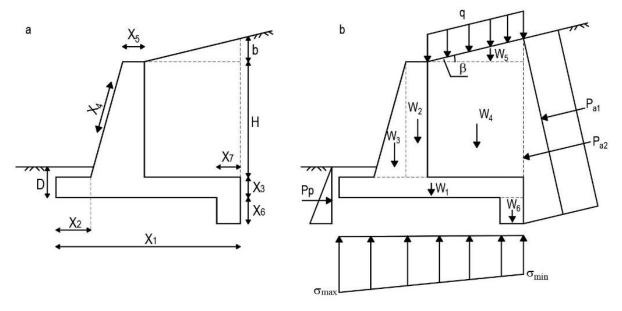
Concrete cantilever retaining wall design with key: (a) wall dimensions; (b) acting loads to the wall.
